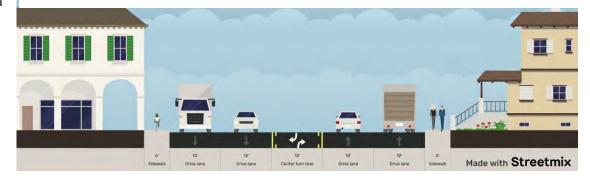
8TH STREET FROM SCHOOL STREET TO GRAND AVENUE
